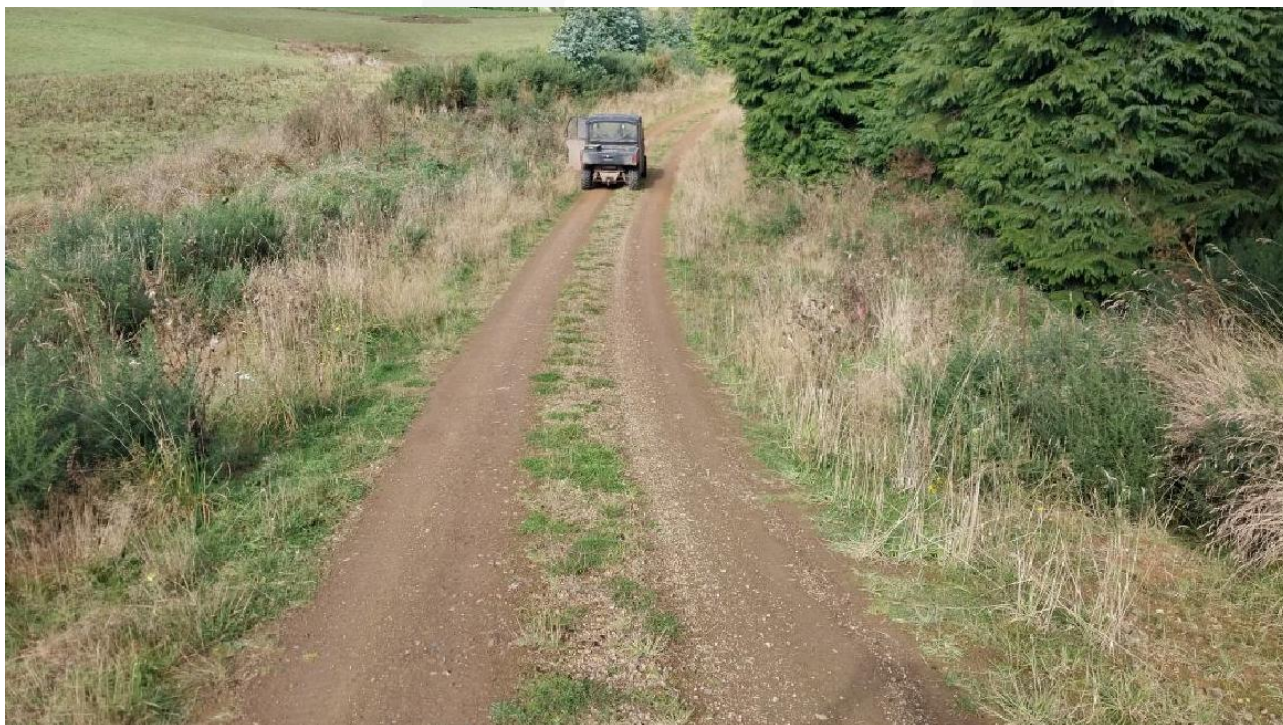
NSC6 – Existing Culvert Crossing (downstream to the left)
